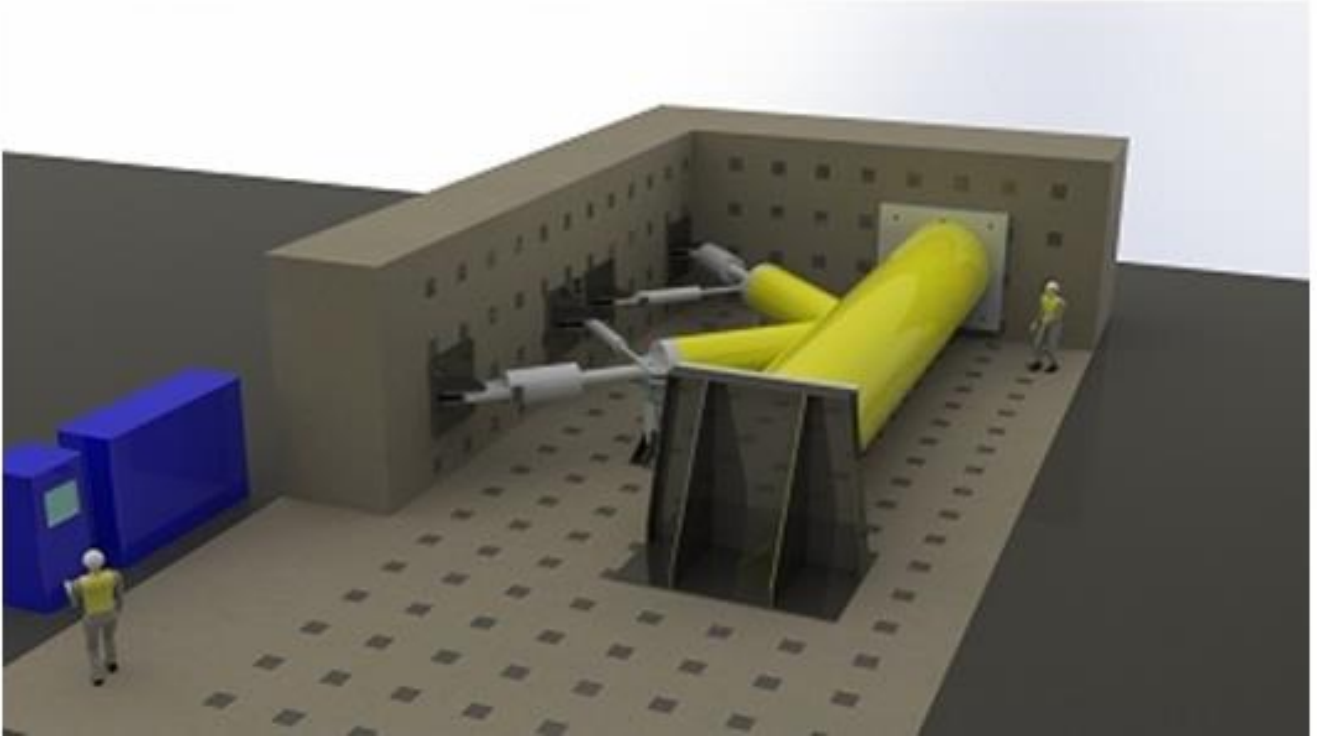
Sketch overview of test setup for K-node on strong floor at FORCE.
